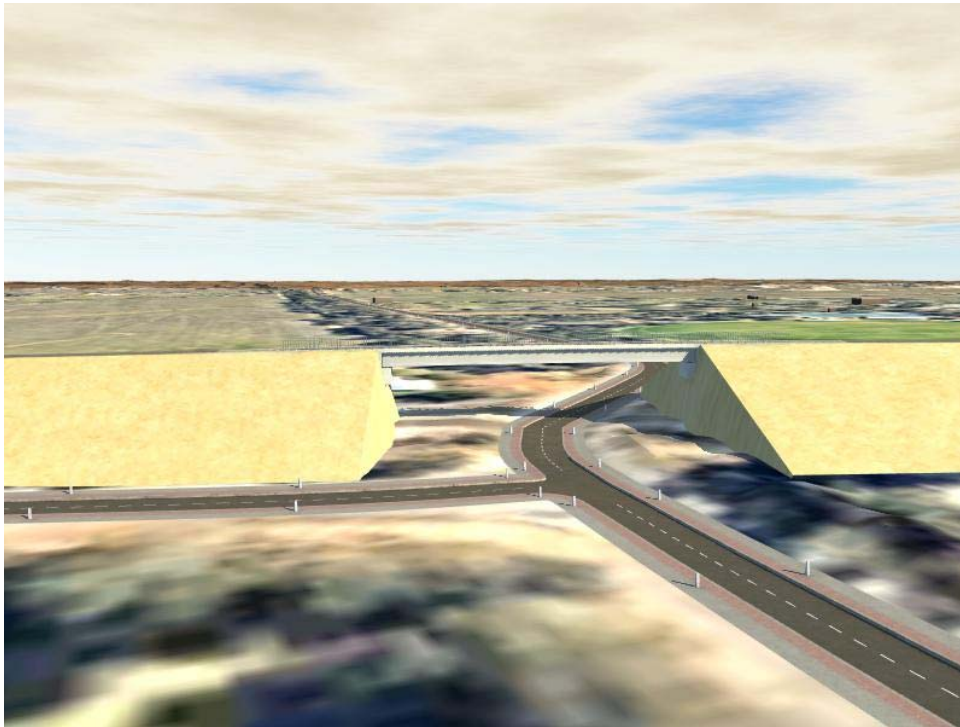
Perspective view of the Whitby Road grade separation
